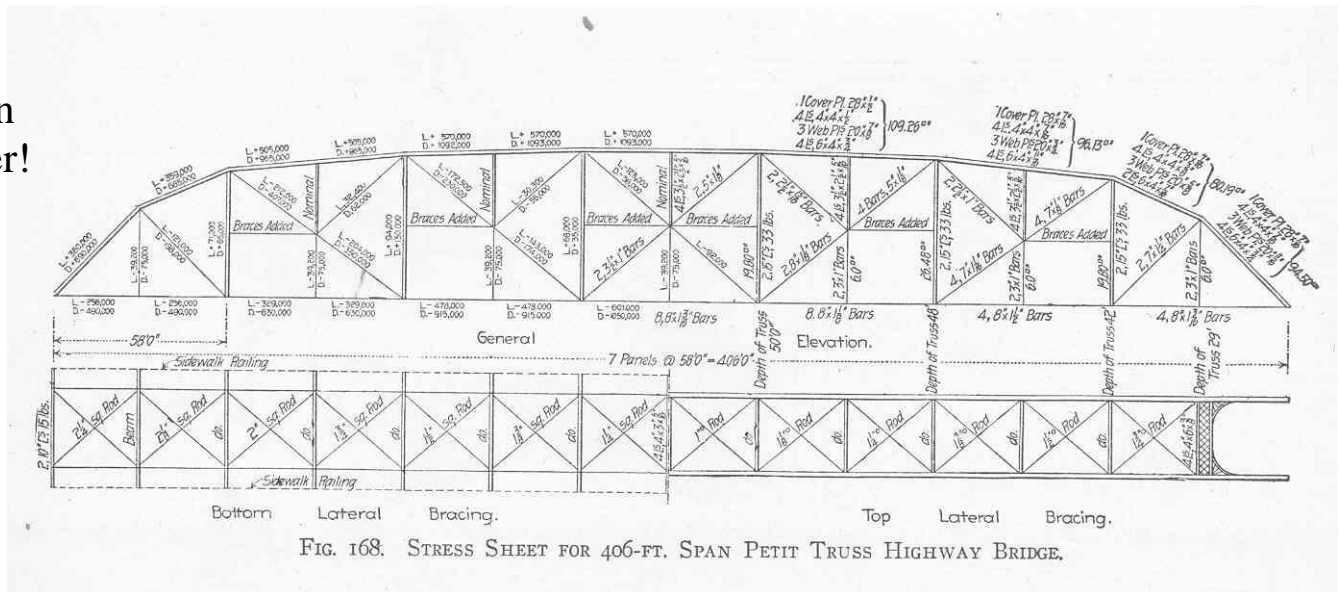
STRESS SHEET FOR 406-FT. SPAN PETIT TRUSS HIGHWAY BRIDGE.
